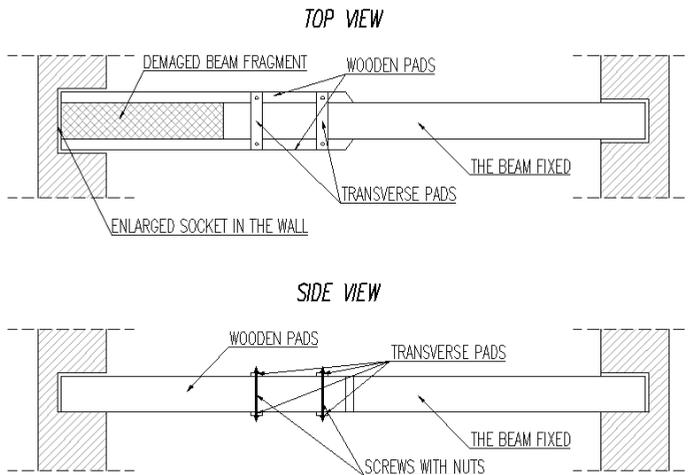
Strengthening of wooden beams using wooden pads [4]
